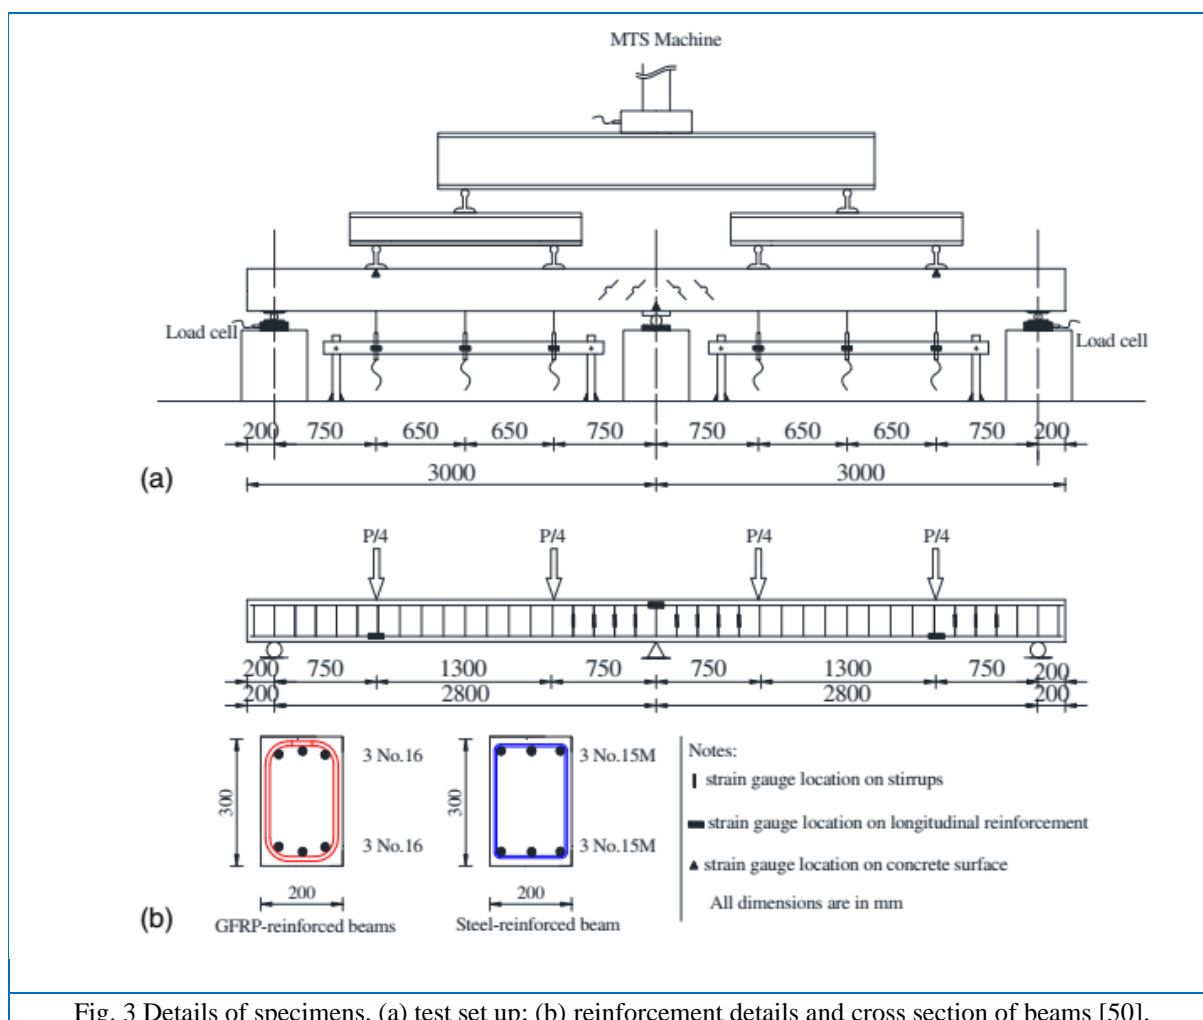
Details of specimens, (a) test set up; (b) reinforcement details and cross section of beams [50].
